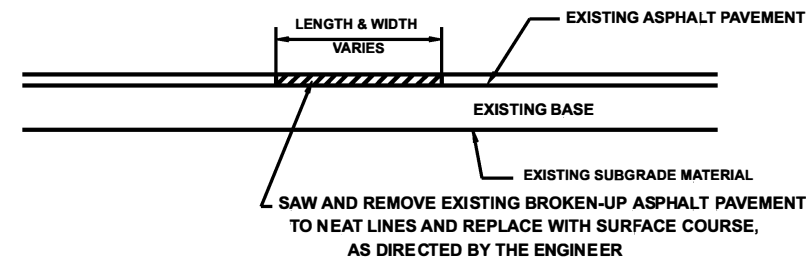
DETAILS OF REPAIRING EXISTING PAVEMENT PRIOR TO RESURFACING FOR FULL DEPTH AND MILLING
